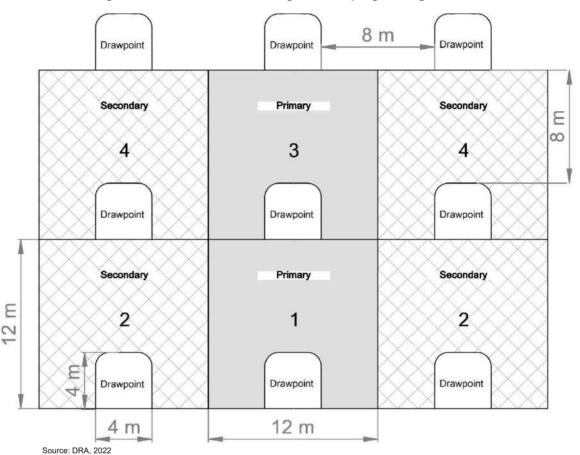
Transverse Long-hole Stoping Mining Method
